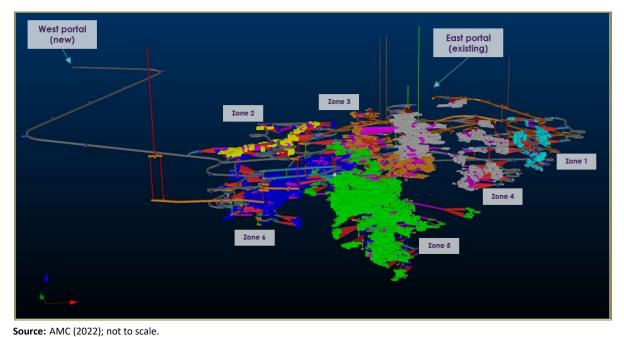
Bermejal Underground Mine Design Overview and Zones, Looking North
